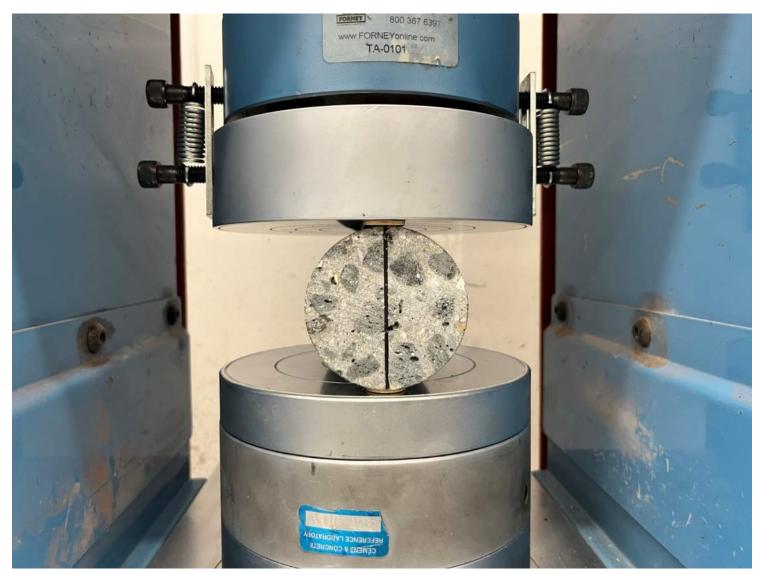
Split tensile testing setup for specimen 4D-1.
